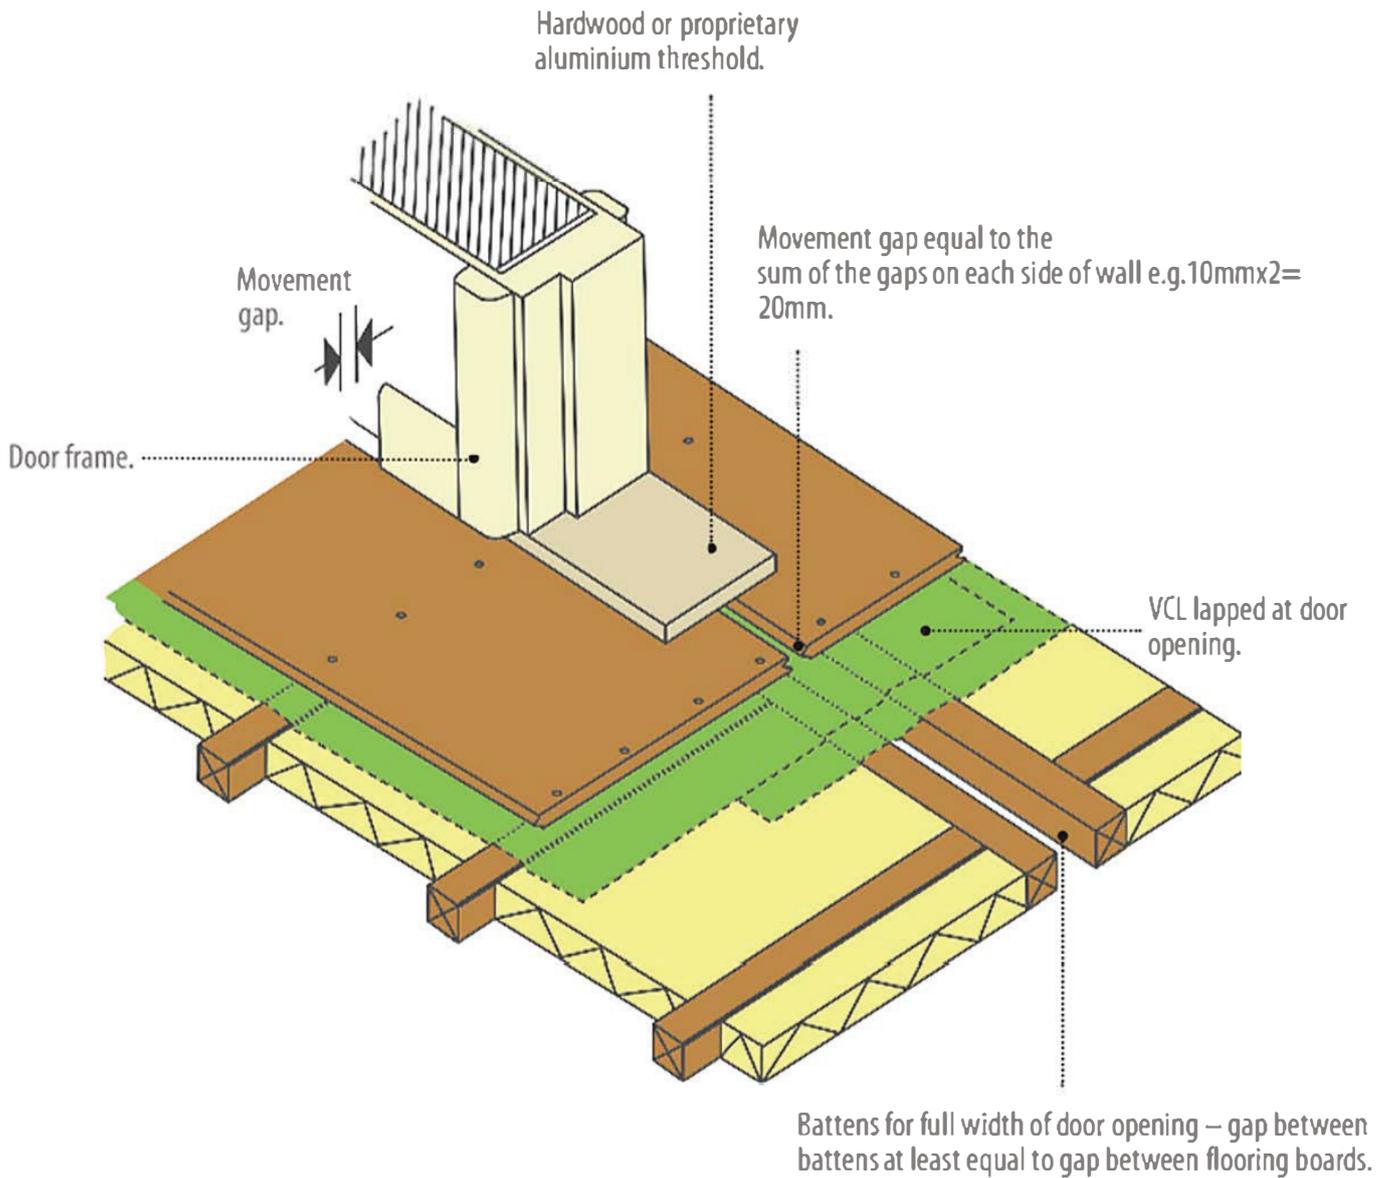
Detail of the threshold of a doorway in a wall which is built off the supporting concrete structure when a battened floor is used.
